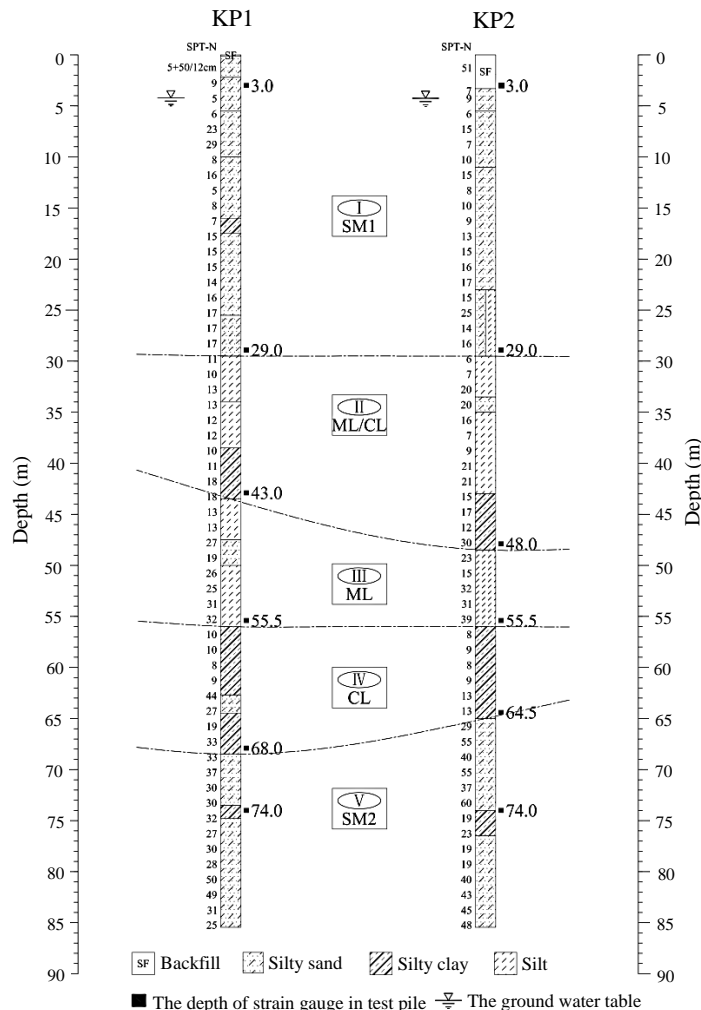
Boring logs at the location of test barrette pile and depths of strain gauge installed (Kaohsiung site)
